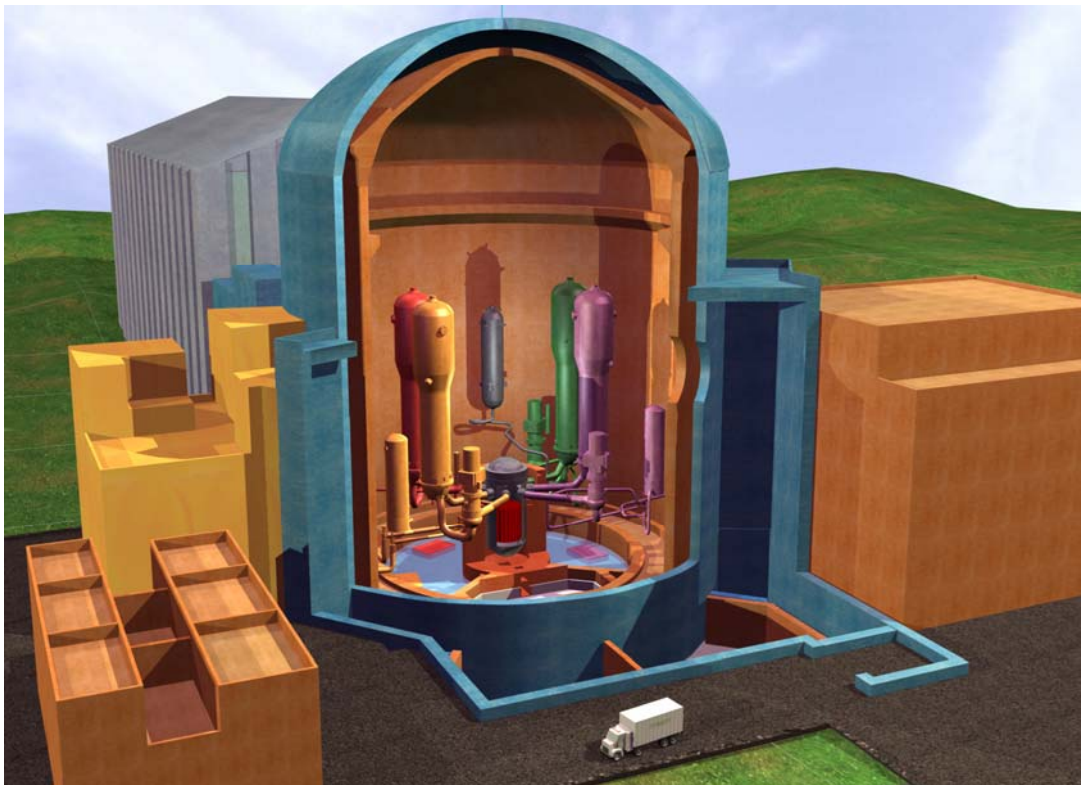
3: CONTAINMENT BUILDING INTERIOR STRUCTURES AND EQUIPMENTS
